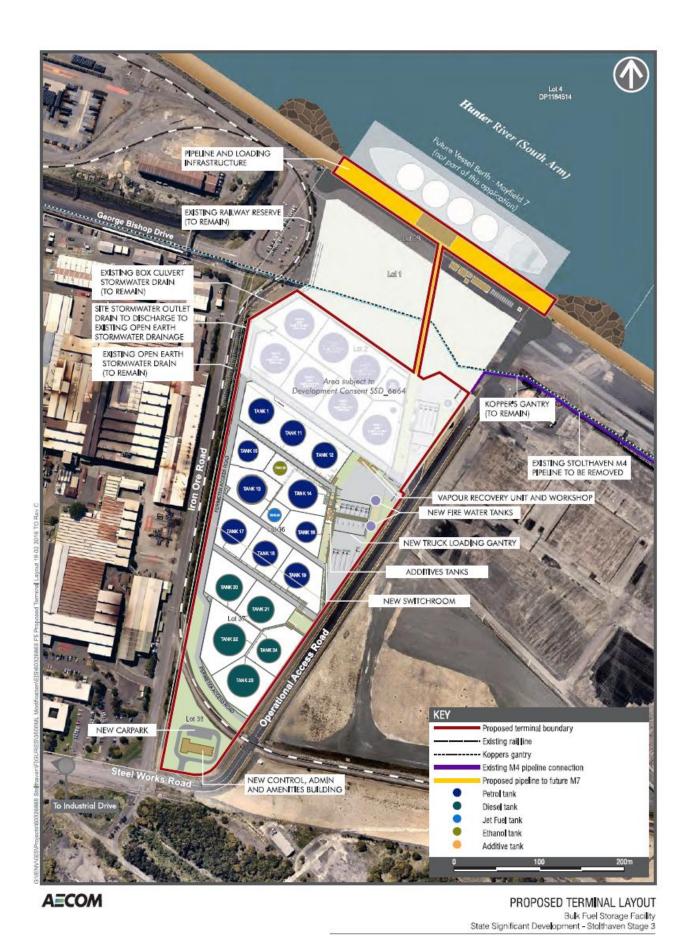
Site layout approved under SSD 7065 (AECOM, 2016)
